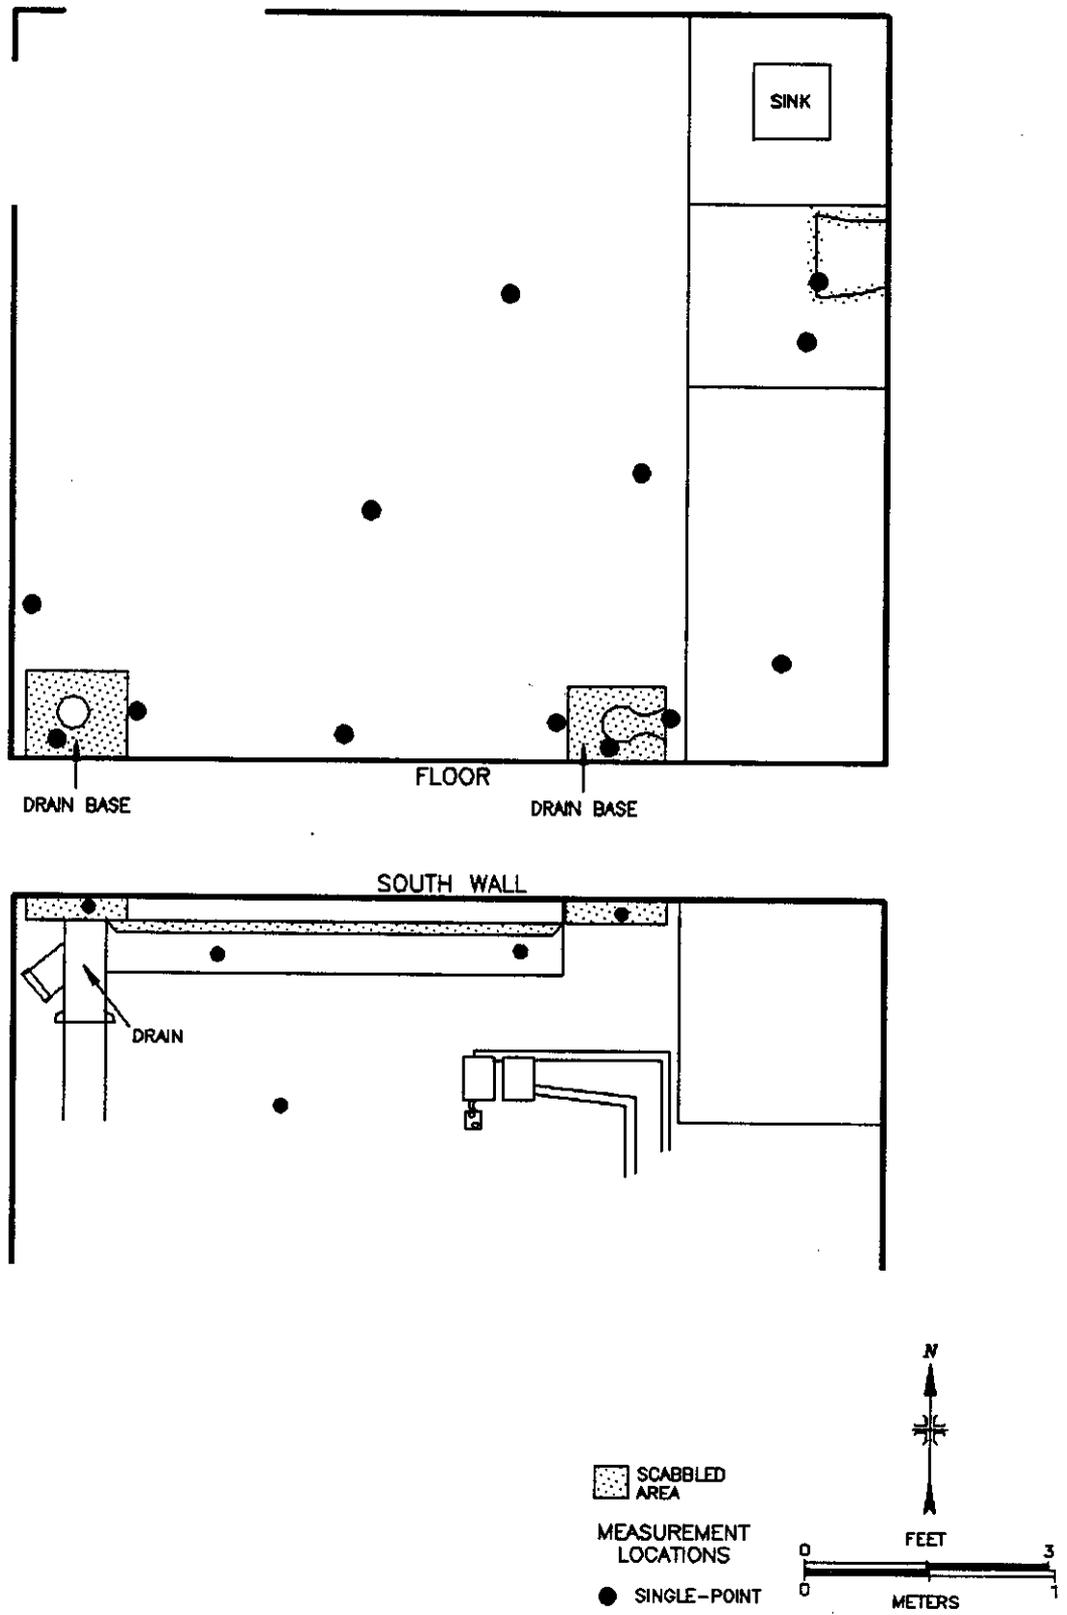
Building 29, Room 109, Indicating Measurement Locations on the Floor and South Wall
